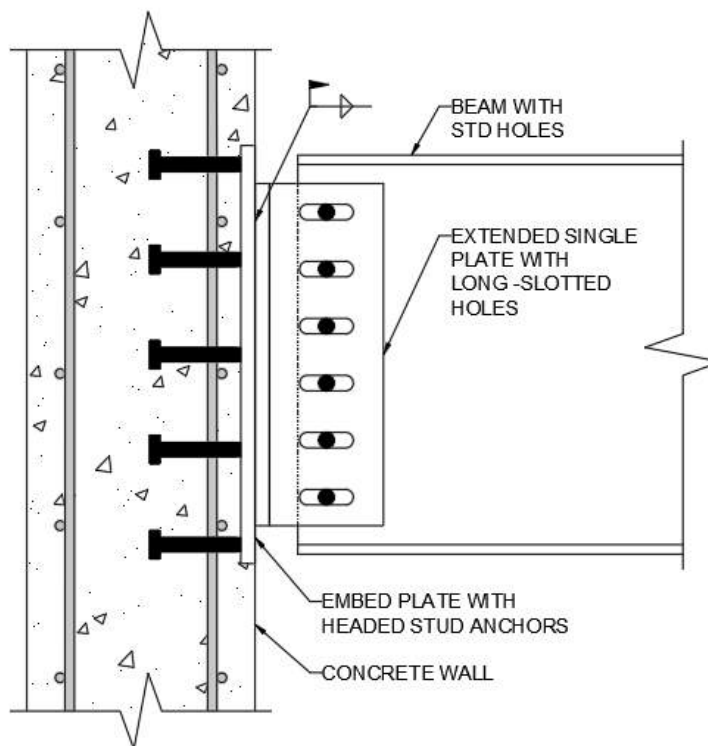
Typical Detail for Single Plate Connection with Long Slots.
